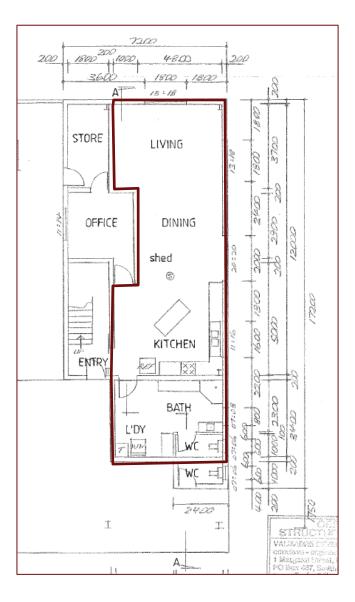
Ground Floor Proposed Caretaker's Accommodation
